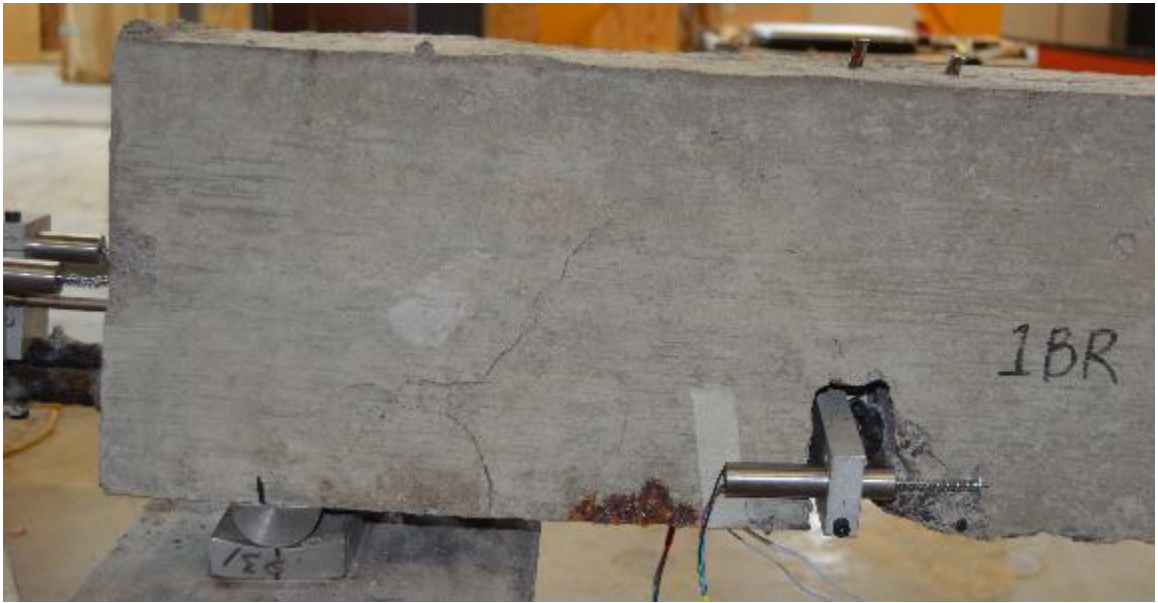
Shear crack at right support of Beam H-U-S-2 (Side B)
